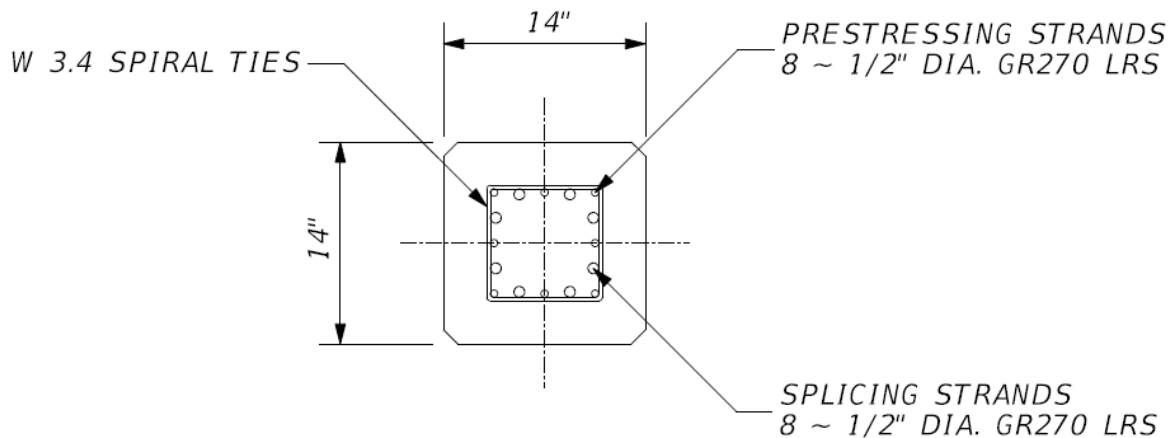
Cross section of 14 in. concrete spliced pile.
